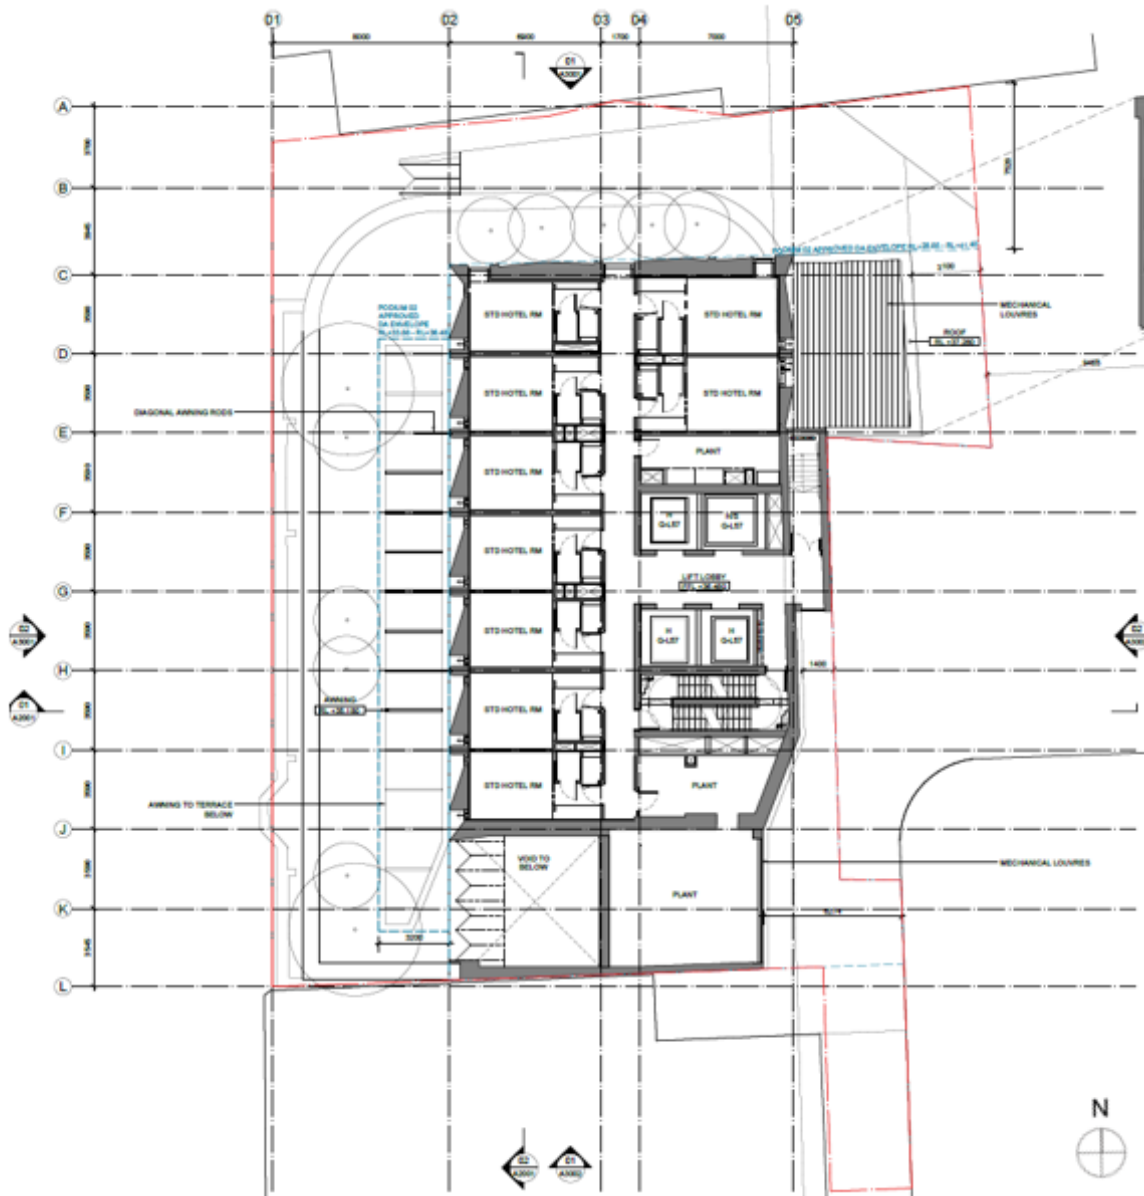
| Proposed third floor plan – top of lower podium (Source: RtS architectural plans)
